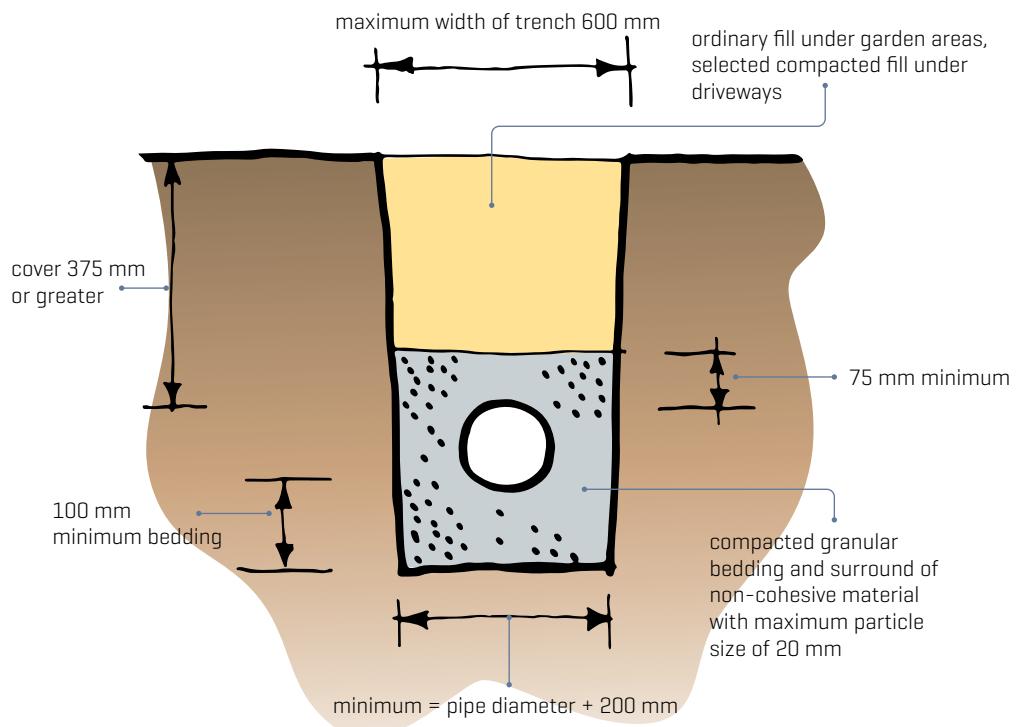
Bedding and backfilling where cover over drain is 375 mm or greater.
